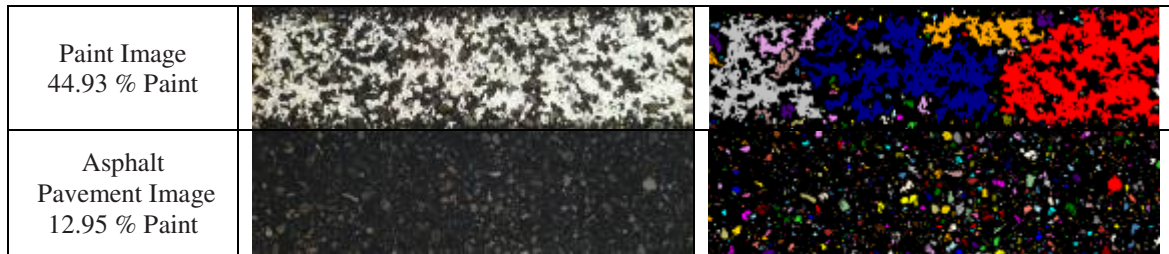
Asphalt pavement images used in test calibration procedure.
